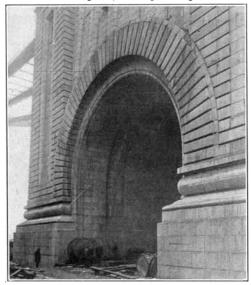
Flank of Anchorage, Manhattan Bridge. Carrère & Hastings, Architects.
